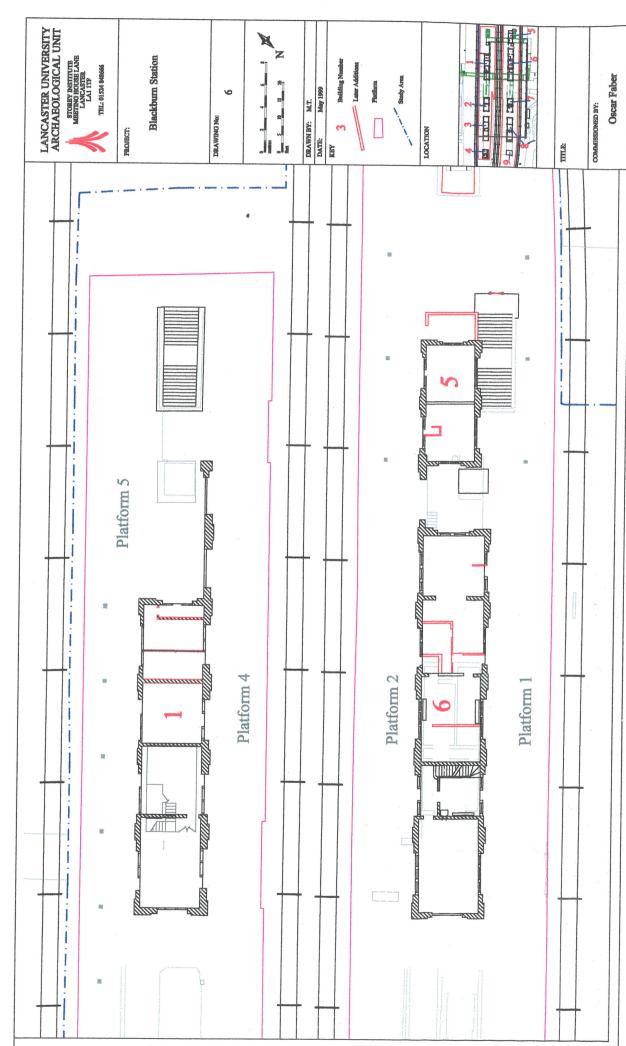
Station South End, Platform Level Plan - Buildings 1, 5 and 6
